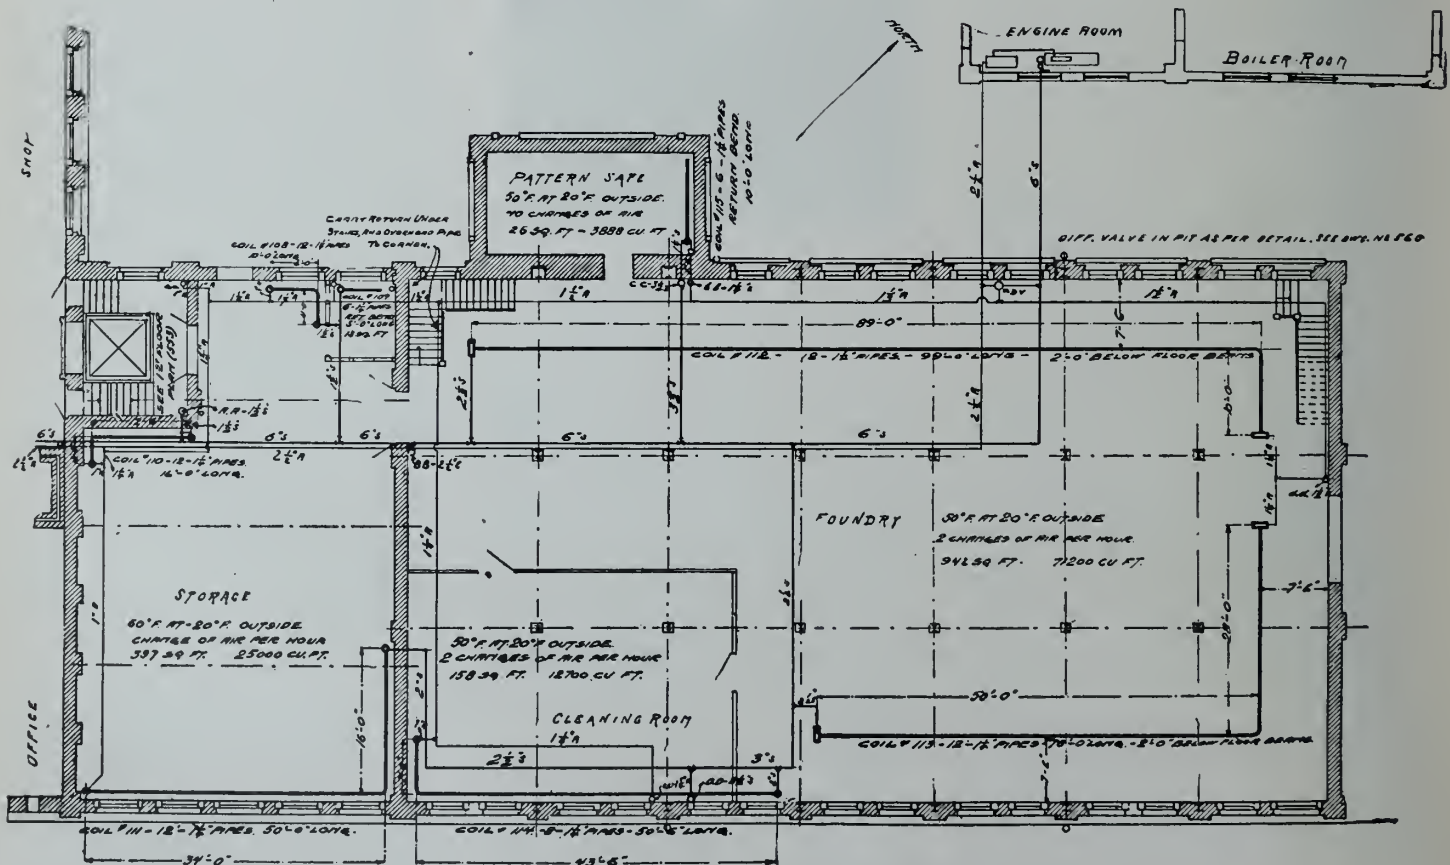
First floor of Brass Foundry, Showing Piping Connections to Power House.
